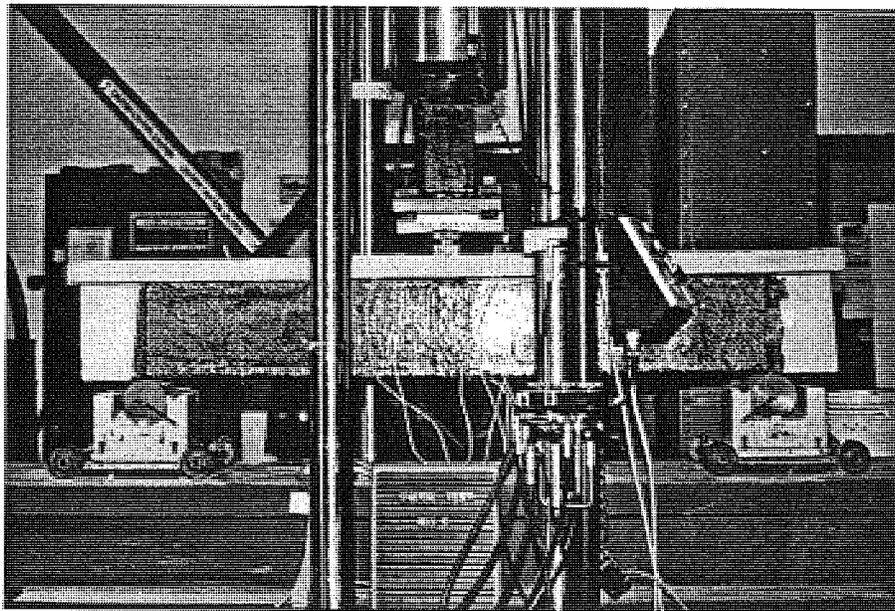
Shear test set-up for T beam strengthened with CFRP sheet
